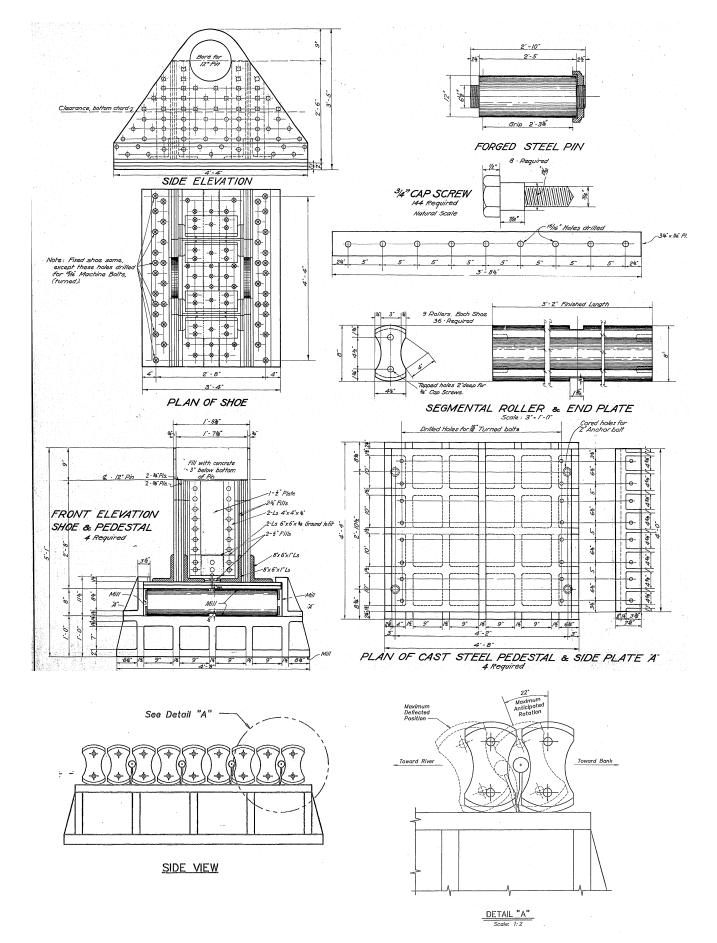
Burnside Bridge Fixed Spans Truss Expansion Bearing and Bearing Seat Width at Piers 1 & 4, w/ modification in 2001
